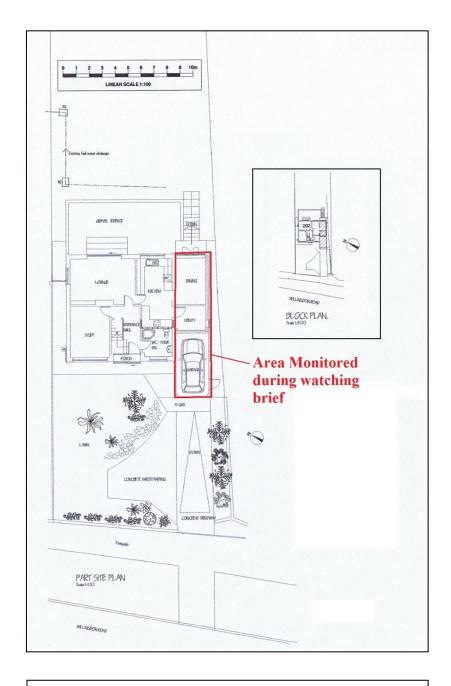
202 Willingdon Road, Eastbourne: Site plan showing area monitored during watching brief
